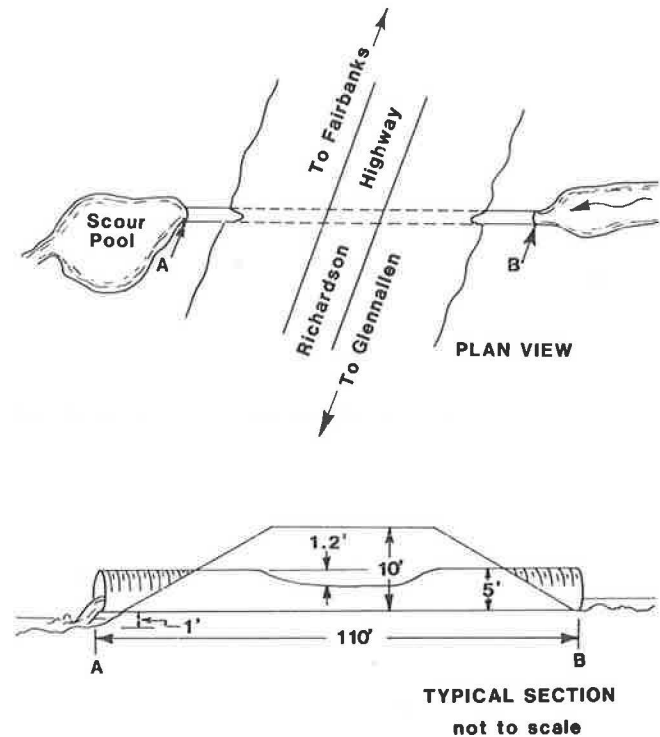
Plan view and typical section Poplar Grove Creek.
